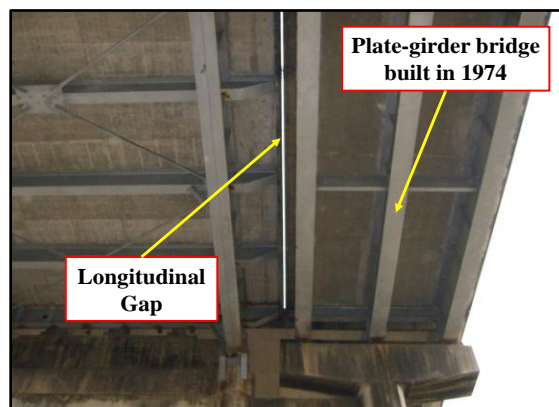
Longitudinal gap and I-girder bridge built during 1974 widening project
